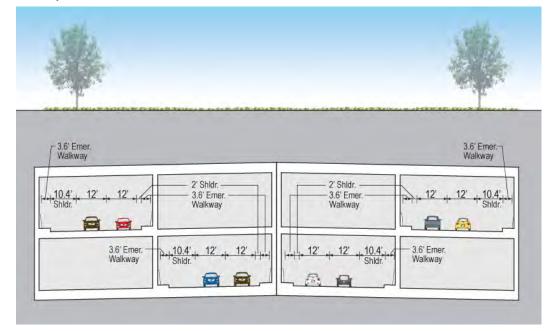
C Freeway Alternatives F-2, F-5, and F-7 Bored Tunnel Cross-Section
